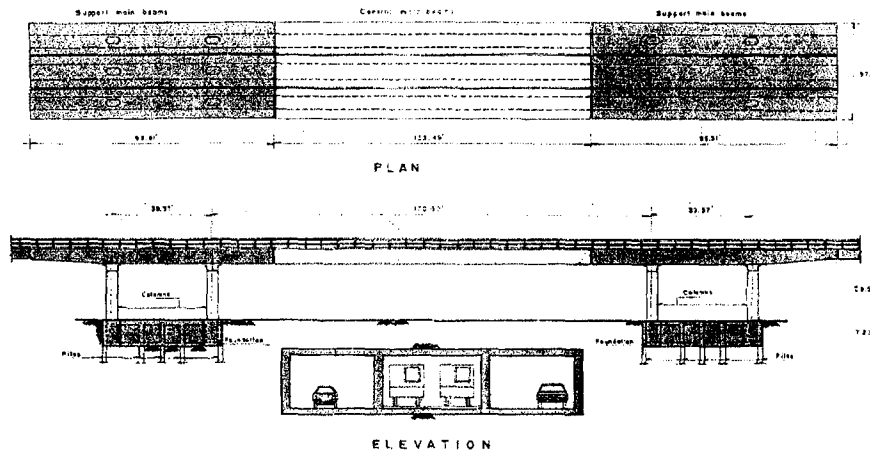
Plan and longitudinal elevation of central part of the bridges.
